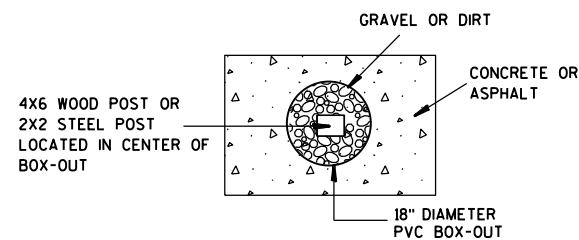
X 6 SIGN POST IN BOX-OUT
